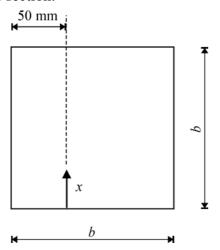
Quadratic concrete specimen with cross section where chloride concentration is investigated.
